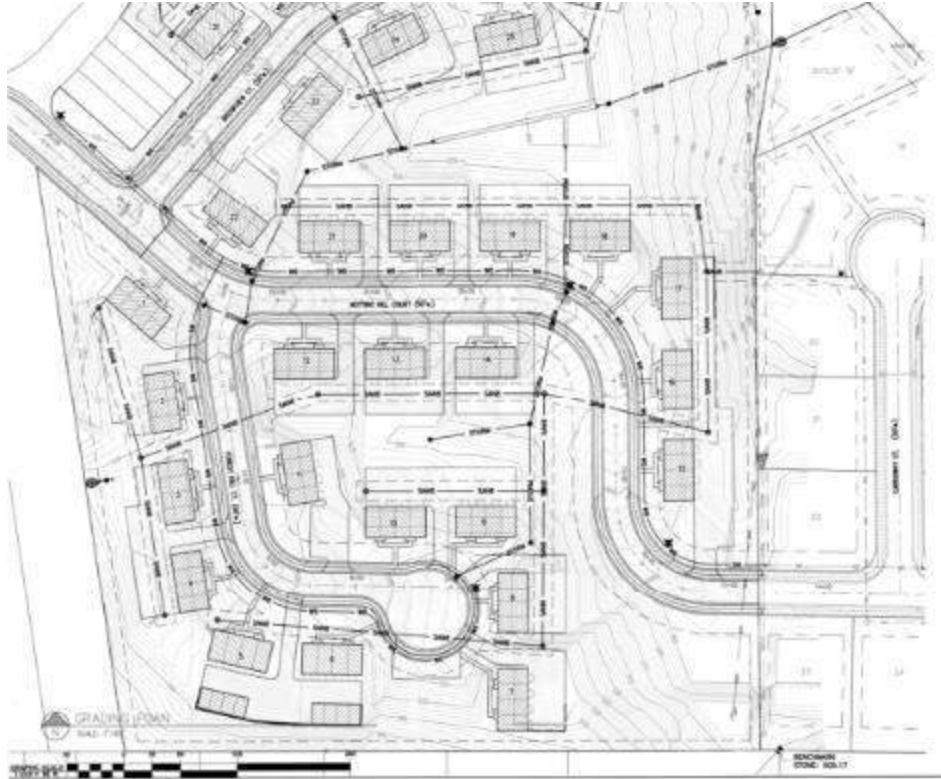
Ramada Blvd. and Notting Hill Road Connection-Alternative 1
